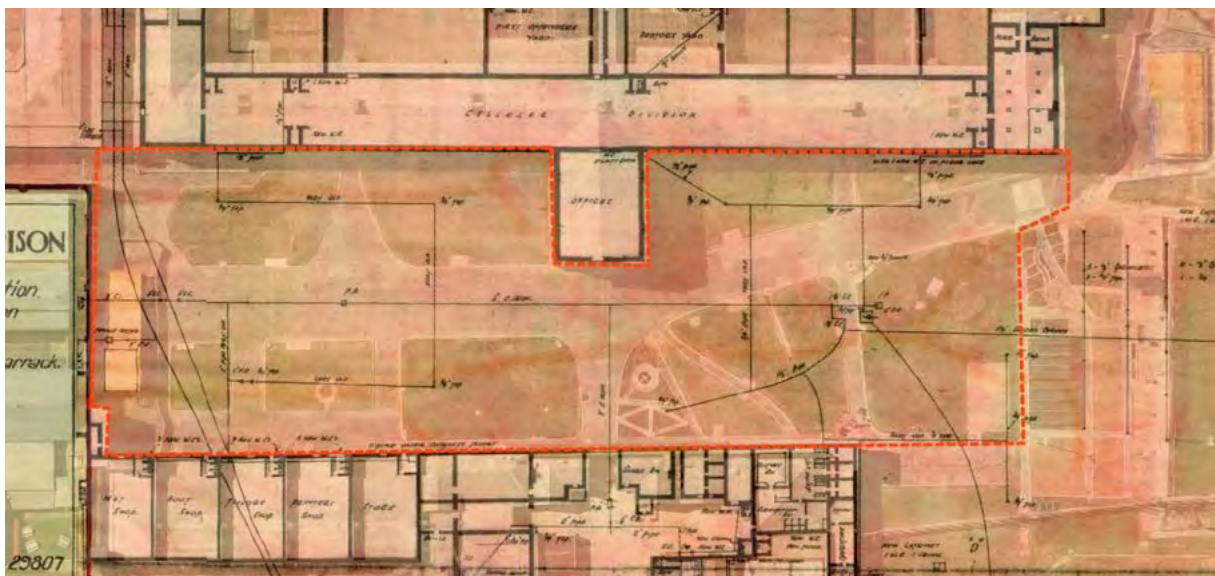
Site plan from 1922 shows the location of new and existing works in the zone.
